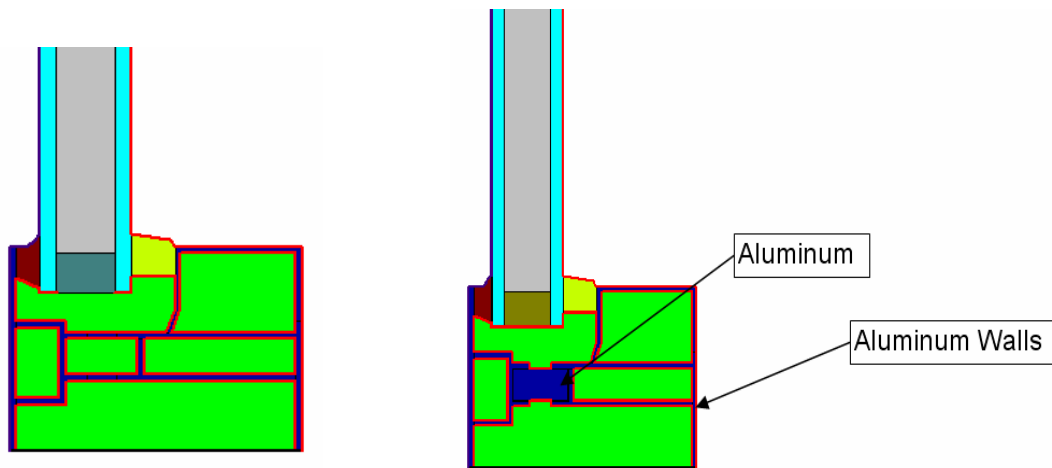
Sill cross-section view of TRR01 and T/B-Al windows
